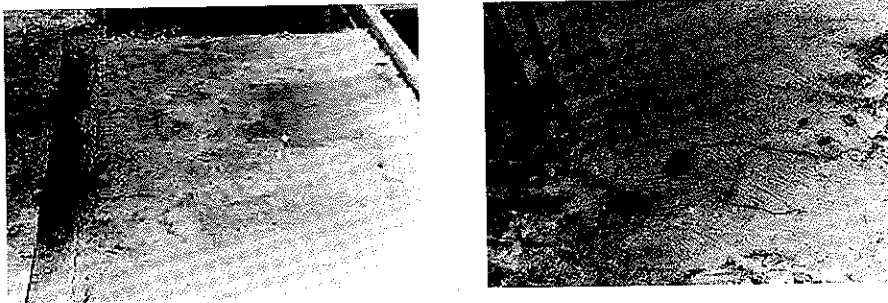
Surface cracks of concrete structures due to plastic deformation
